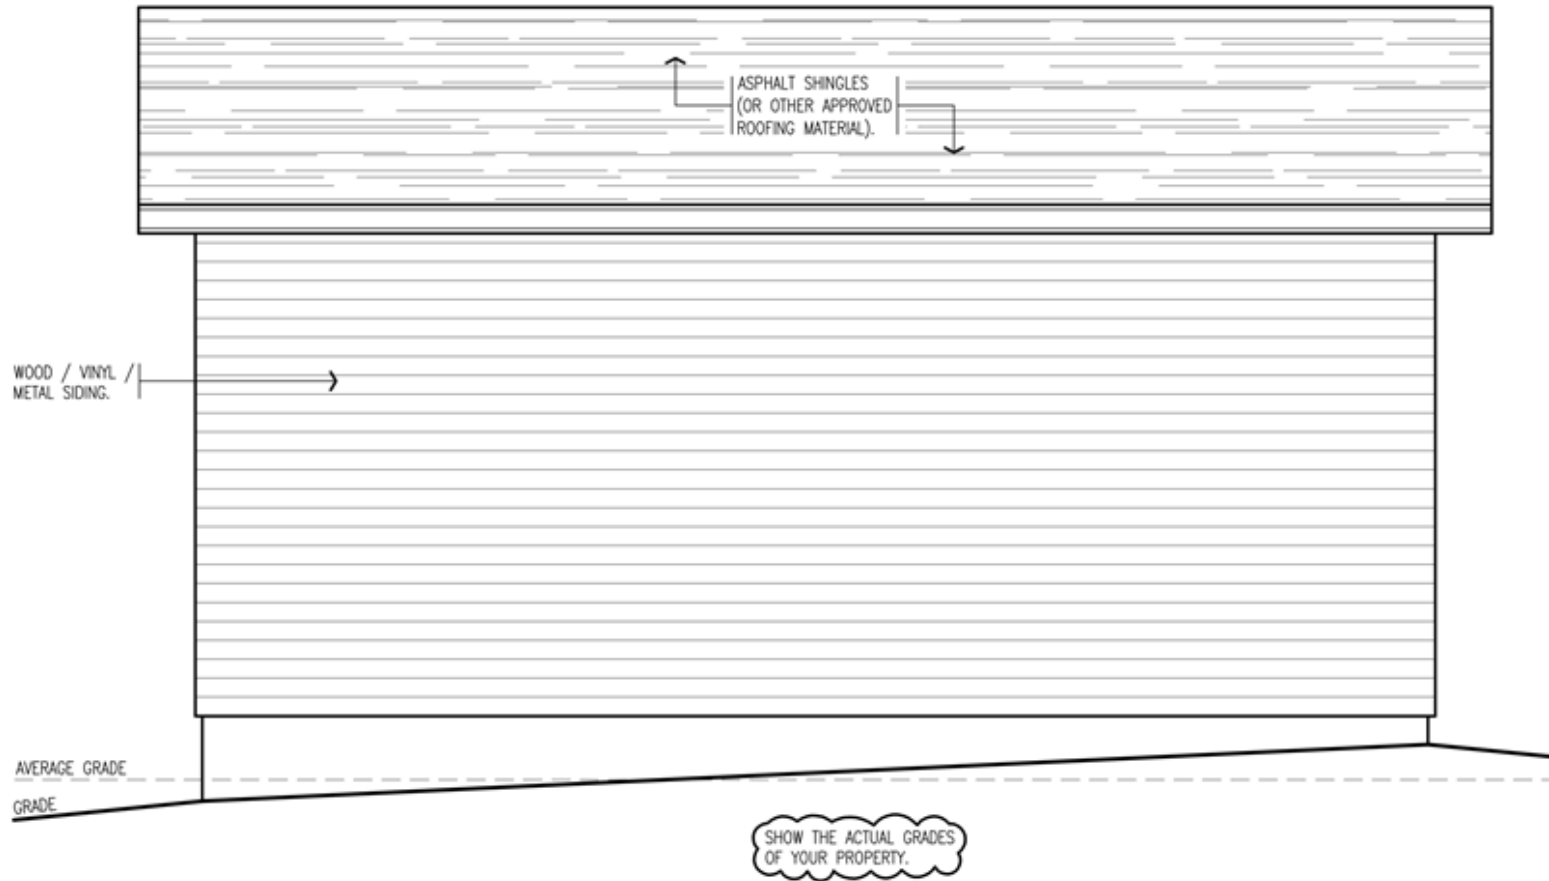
of 9: FRONT ELEVATION – Accessory Structure
